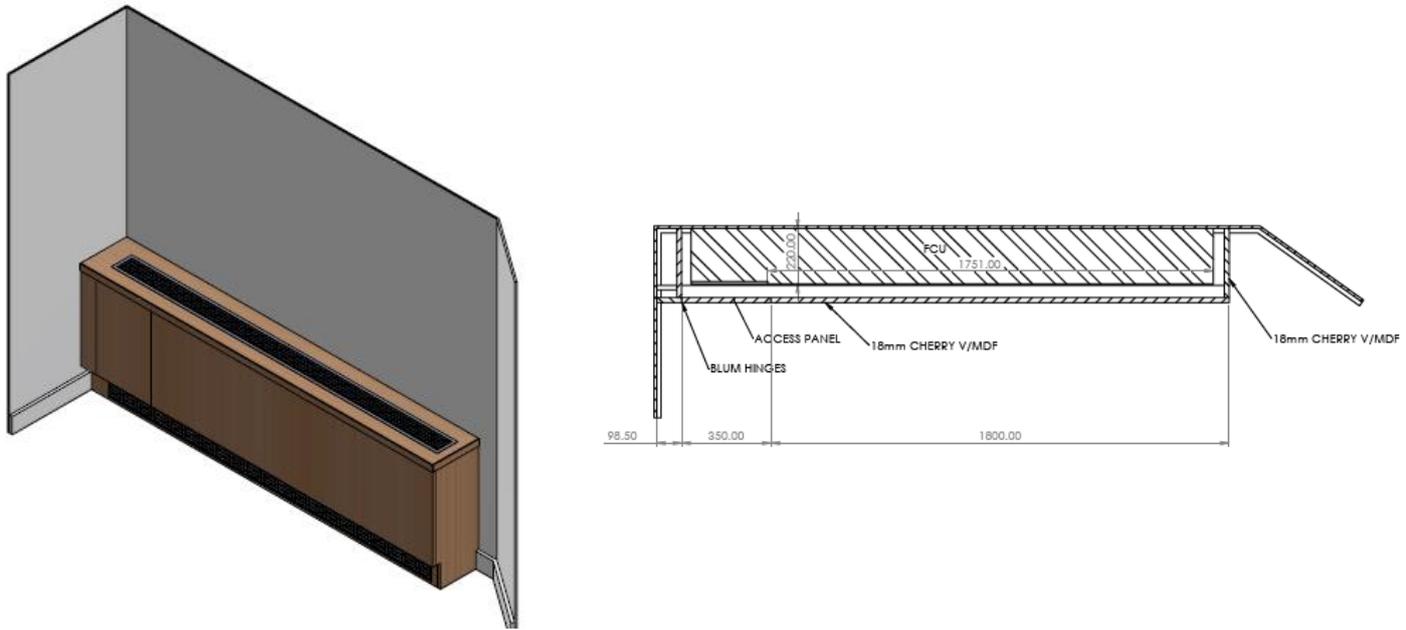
Drawing and section of the proposed joinery (extract from drawing ref. 3012-UCL-SD02)
